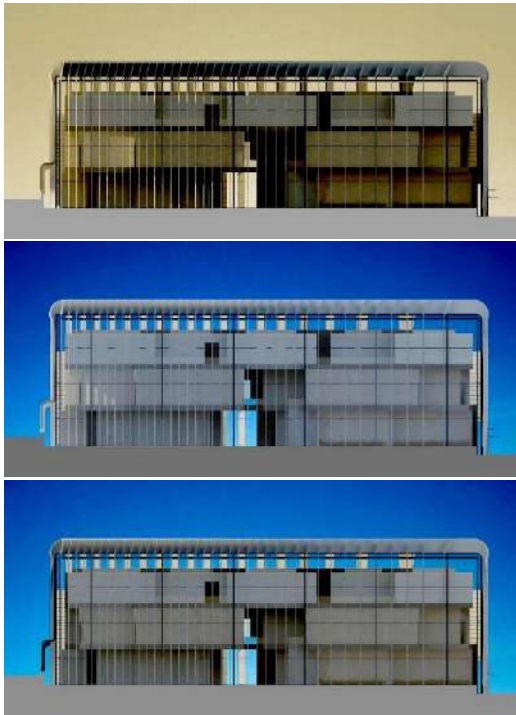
December 21, North Elevations, 9 AM, 12 PM and 3 PM (Personal Rendering)
